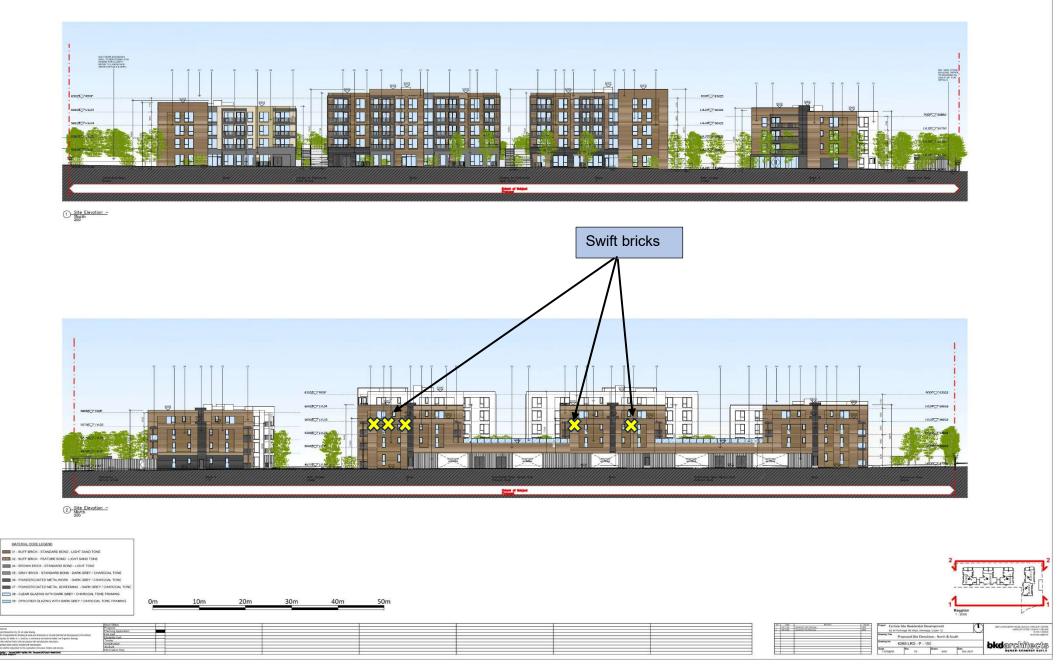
Site elevations demonstrating location of swift bricks- sheet 01
